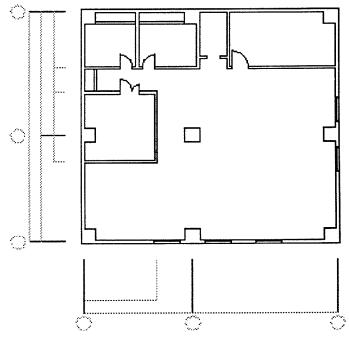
Simplified Plan Drawing. AutoMOD interpretes columns, walls, doors and windows in a plan drawing. Light color lines are ignored in interpretation.
